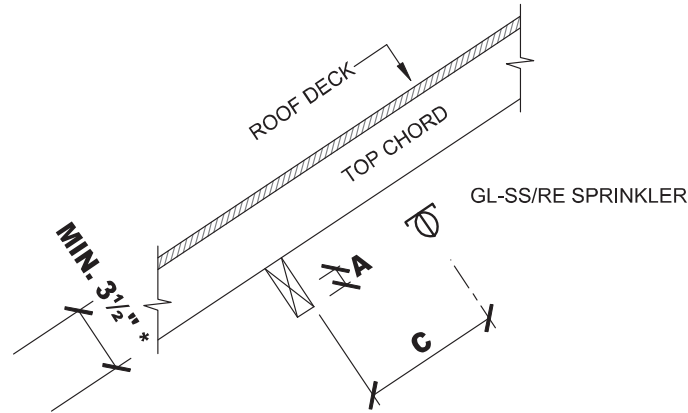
SUSPENDED HORIZONTAL OBSTRUCTIONS GL-SS/RE/GL-SS/DS SPRINKLERS
